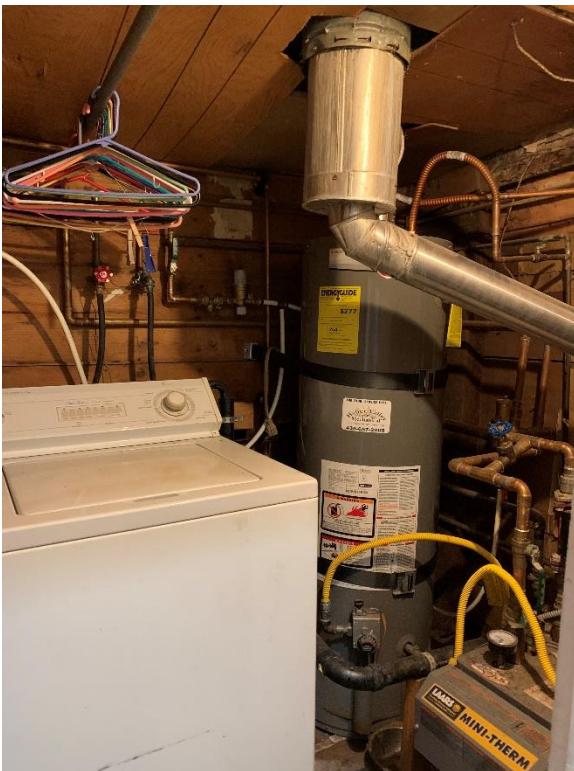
KitchenPhoto 19: Mechanical roomPhoto 18: Mechanical roomPhoto 20: Laundry
